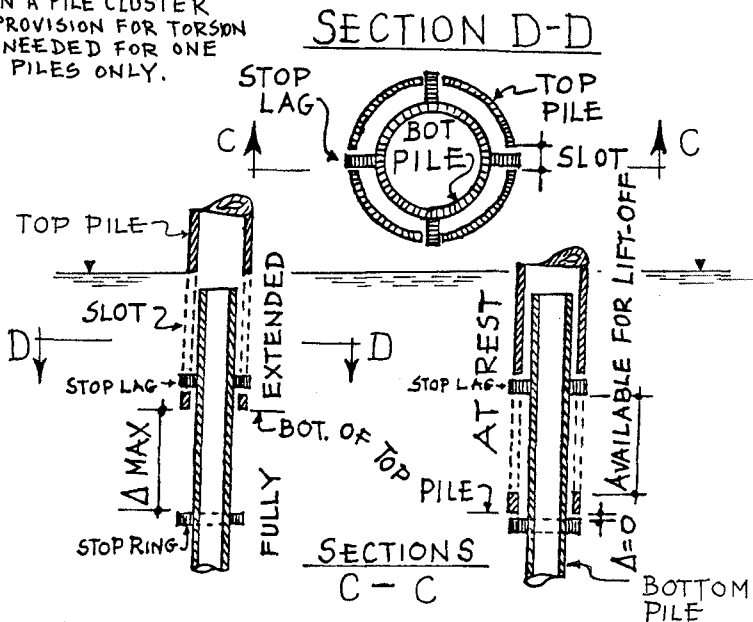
DETAIL OF SLIP JOINT IN PILES
